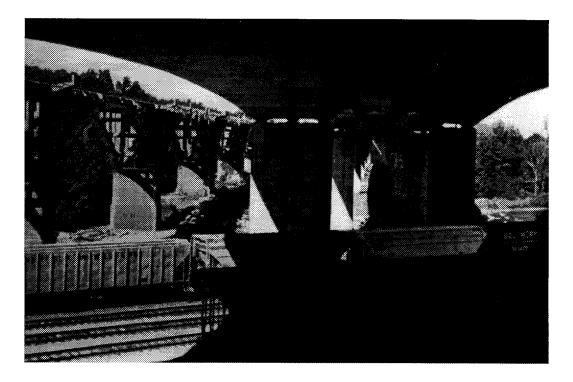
R. E. Lee Bridge during early stages of demolition in background. Vantage point is beneath new bridge.
